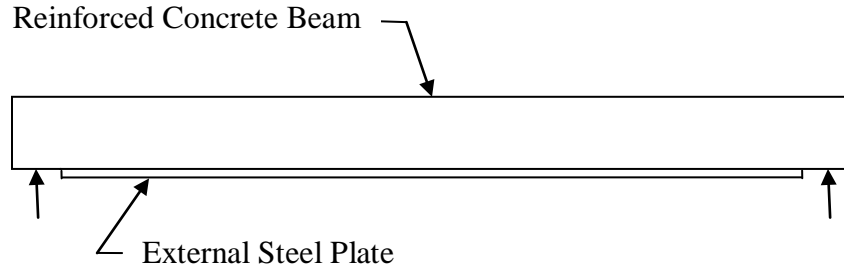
Reinforced Concrete Beam with Bonded Steel Plate
